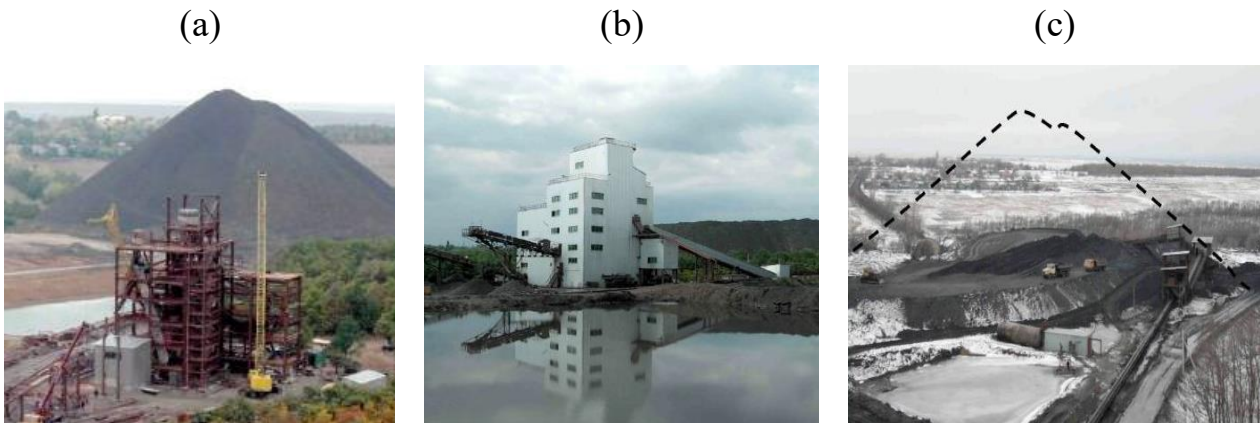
Beneficiation plant for processing dump waste rock mass: (a) the stage of construction and installation of the plant equipment; (b) view of the constructed plant module; (c) recycled dump and closed quarry filled with waste rock
